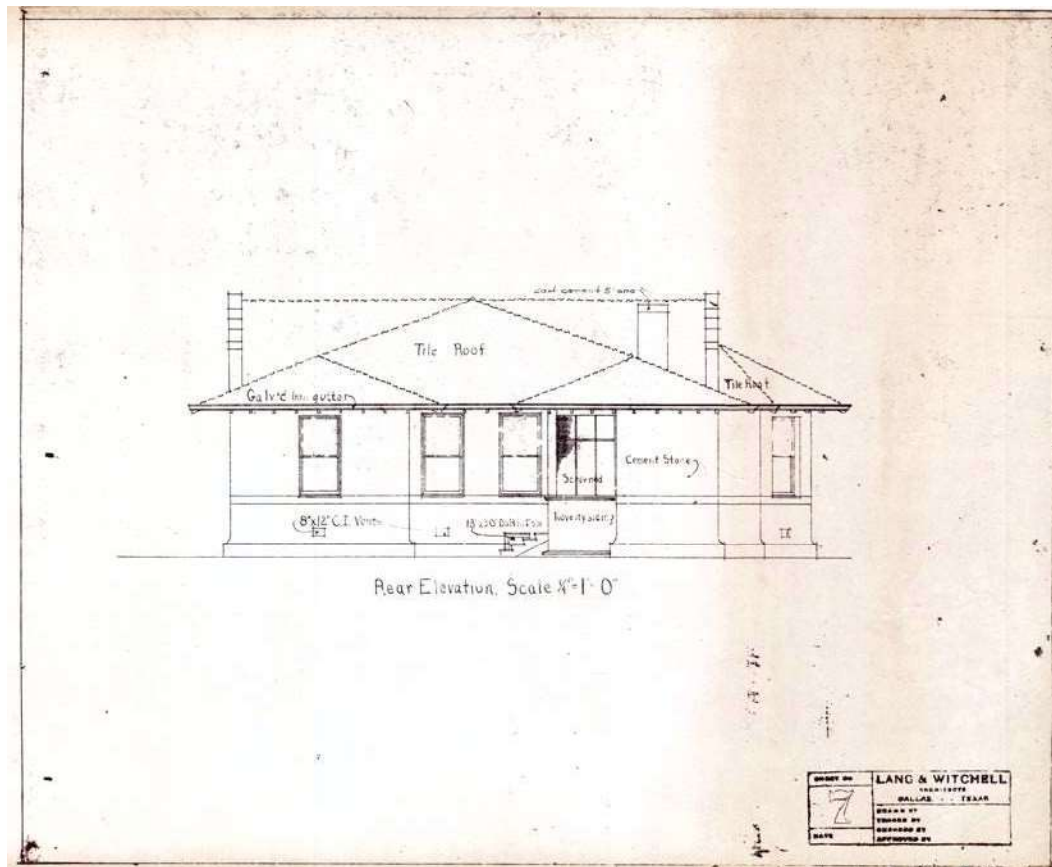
Original Lang and Witchell Rear (Northwest) Elevation—Sheet 7
